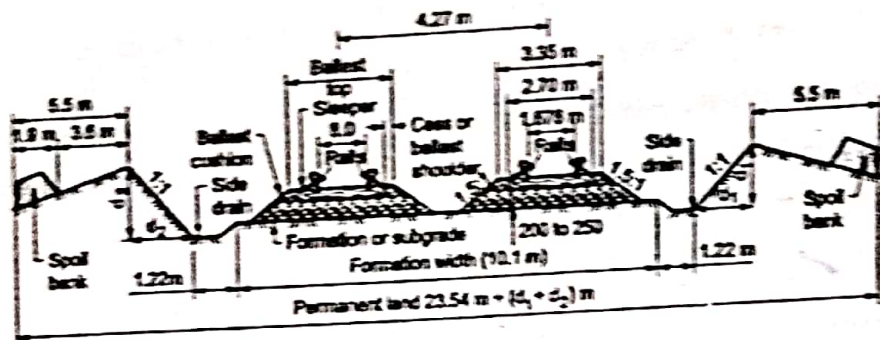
Cross-section of a double broad gauge track in cutting
